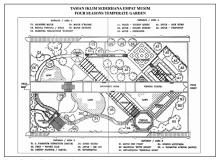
Floor Plan of the Four Seasons Temperate Plant House
